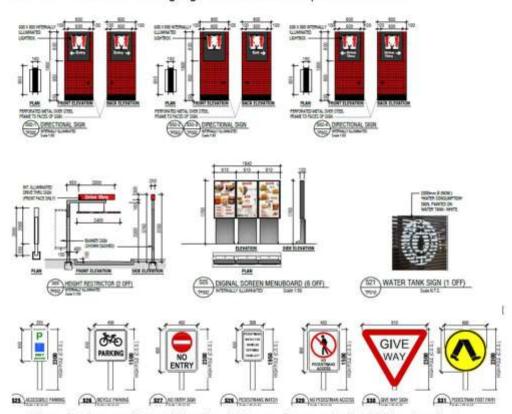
Proposed Street/Directional Signage (Source: Voda Building Services)
